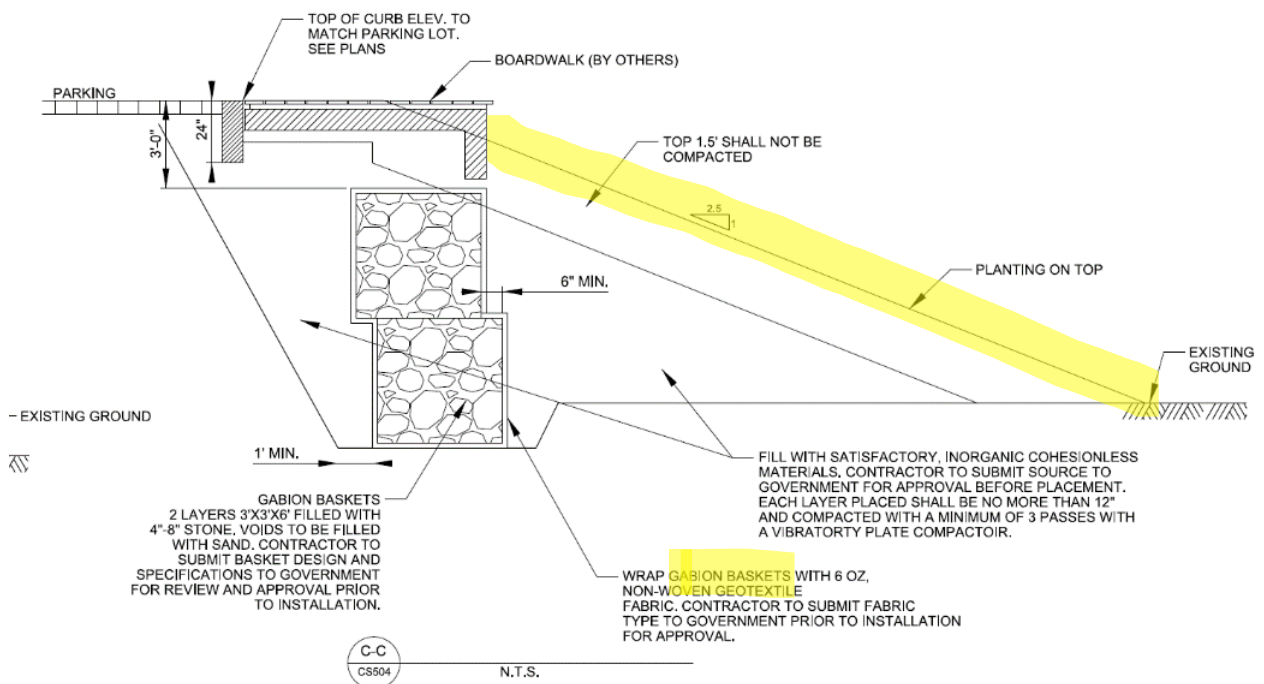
Boardwalk Cross Section, Detail C-C on Sheet CS301 of 2015 USACE Plans
